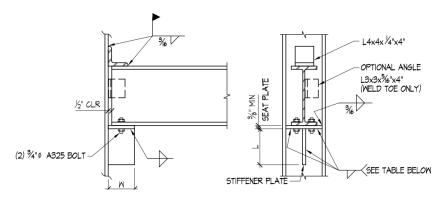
Typical Stiffened Seat Beam Connections Detail, 2/S2.01
